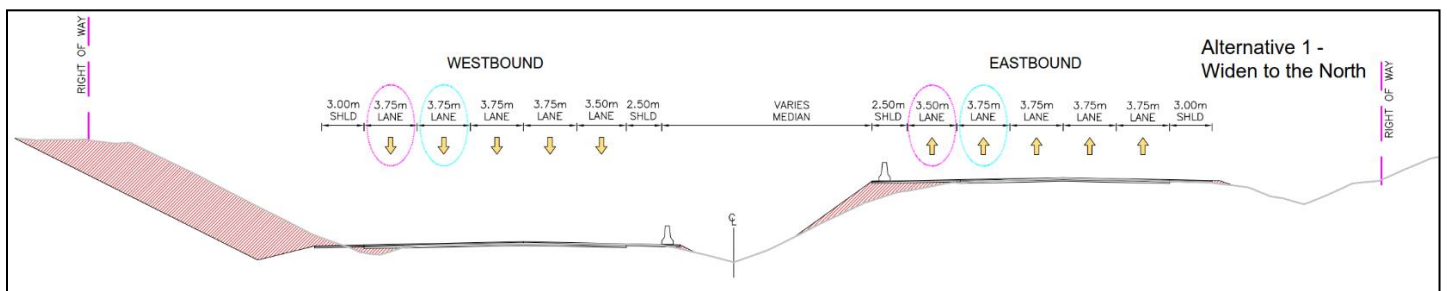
Cross Section for Section 2 – Extend Fully to the North (10-Lane)
